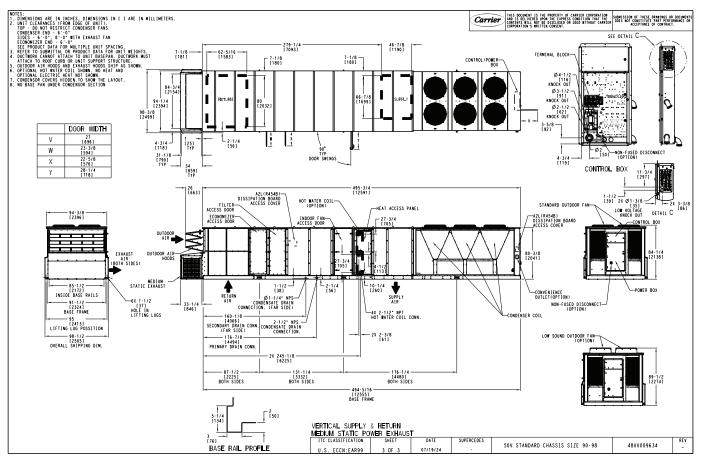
50V 90-100 Ton Standard Chassis (cont)
